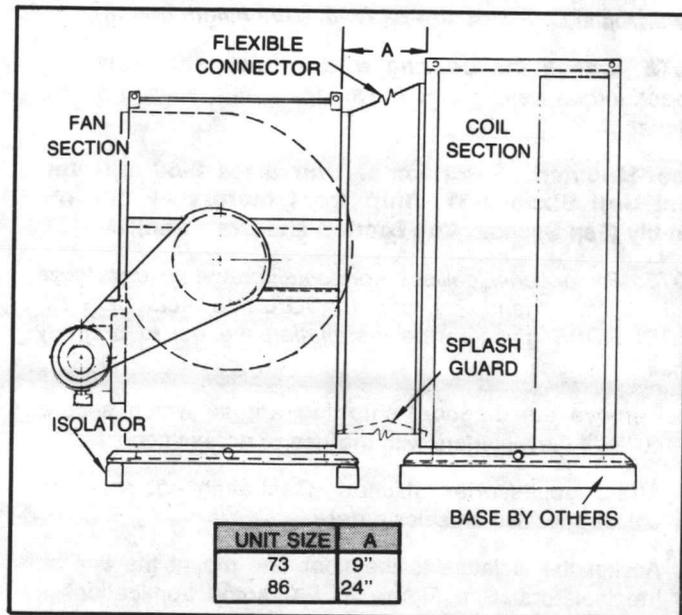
Mounting Clearance Dimensions for Draw-Thru Units Sizes 73-86
